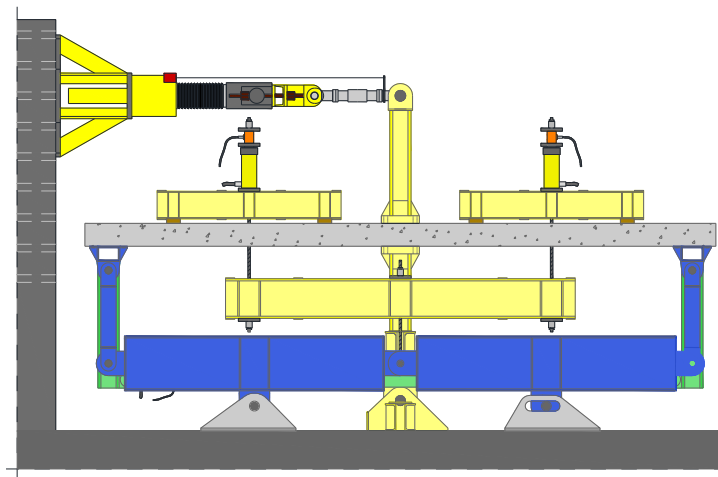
Elevation drawing of the test setup (Almeida et al. 2016)
